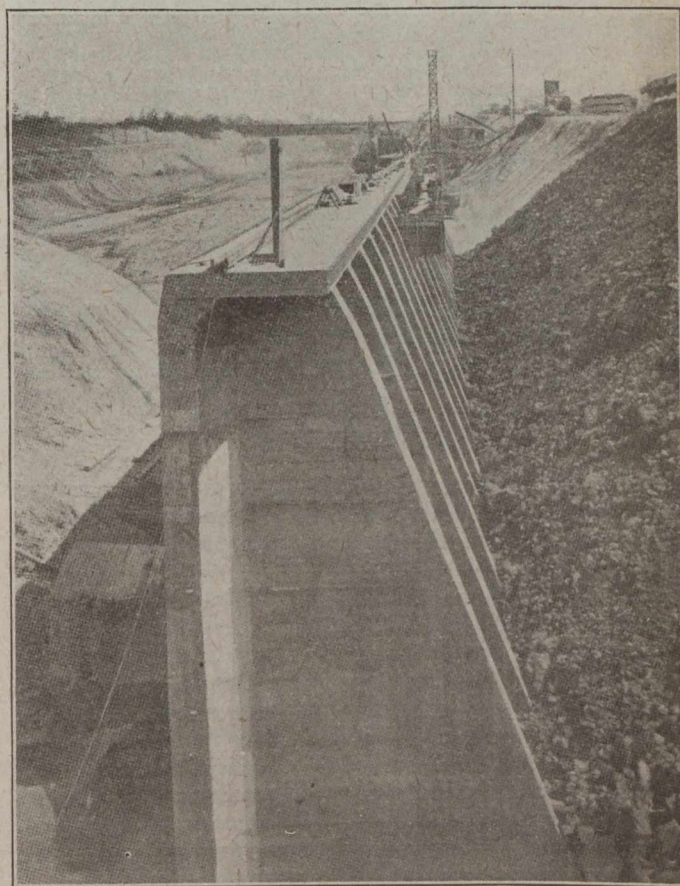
Reinforced Concrete Wall, Lock No. 1 being Backfilled
